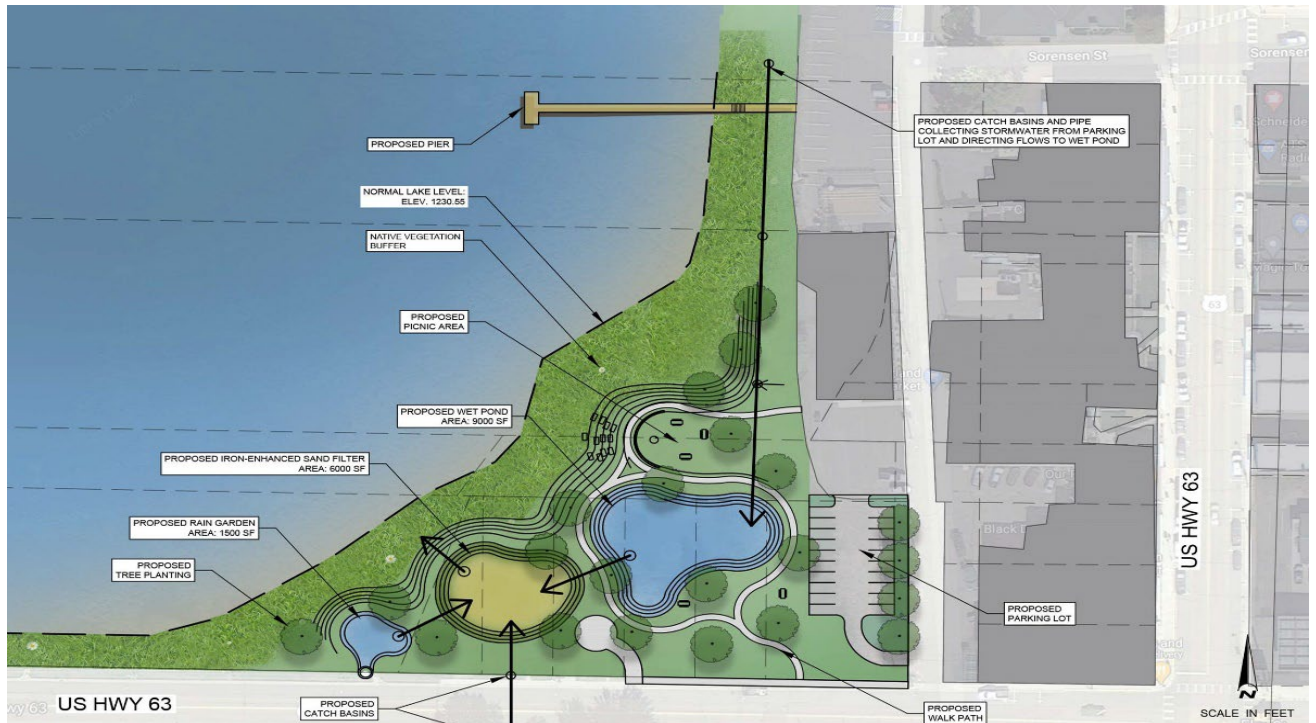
Concept Plan for Library Lake Southeast Stormwater Park
